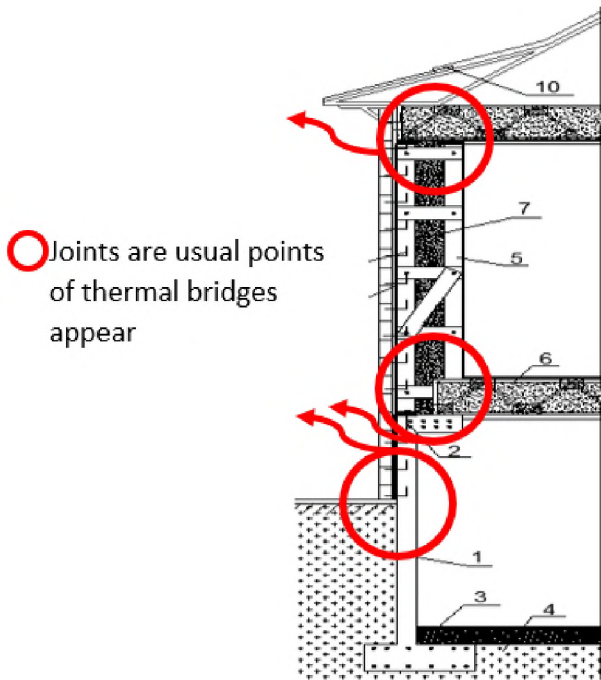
Typical wall structure of ecological low-rise building with the points where thermal bridges appear
